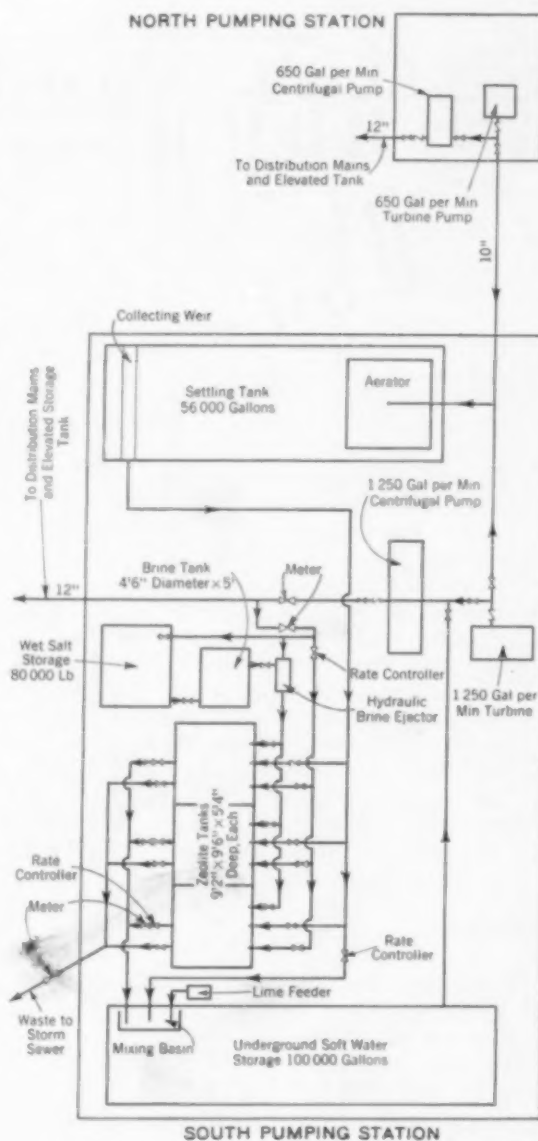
DIAGRAMMATIC PLAN OF PUMPING STATIONS AND WATER TREATMENT PLANT
